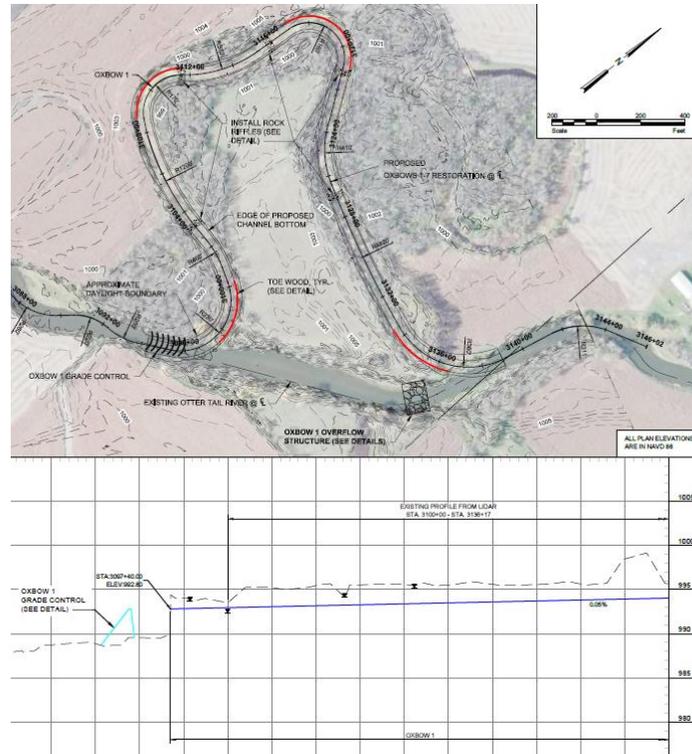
Example of Oxbow Excavation (Oxbow 1 of FG 7)
